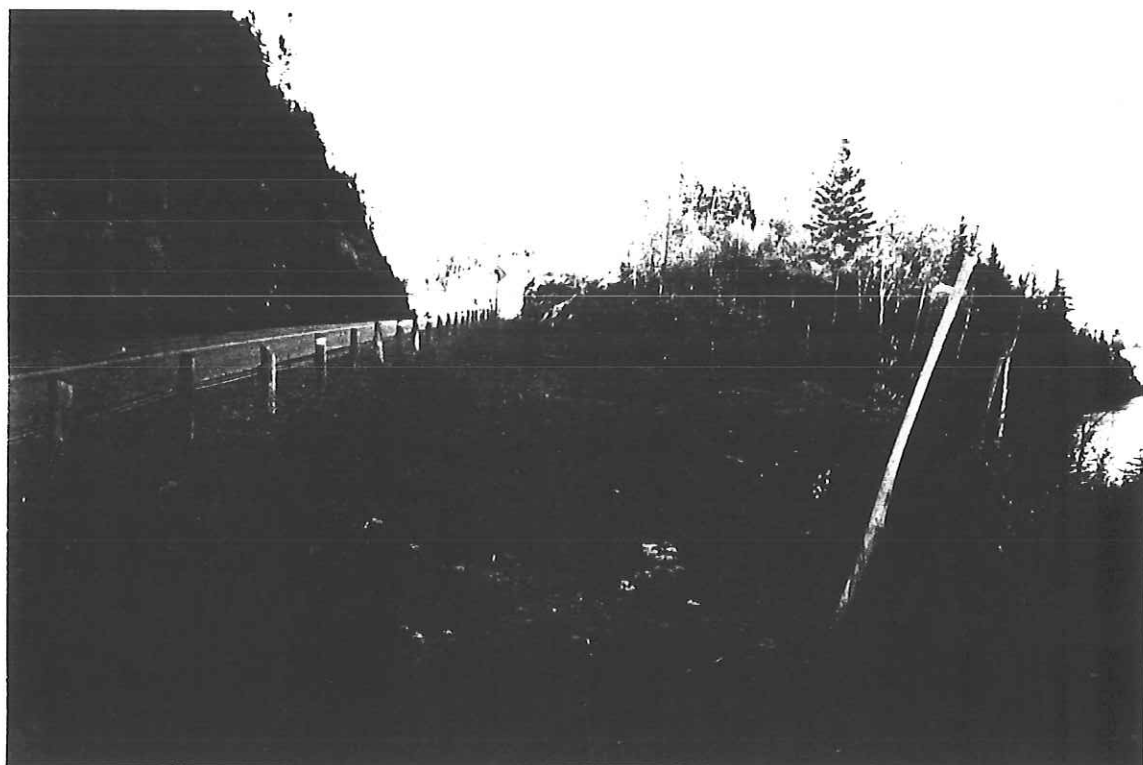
Bench to north of highway opposite 16+900, founded on bedrock
